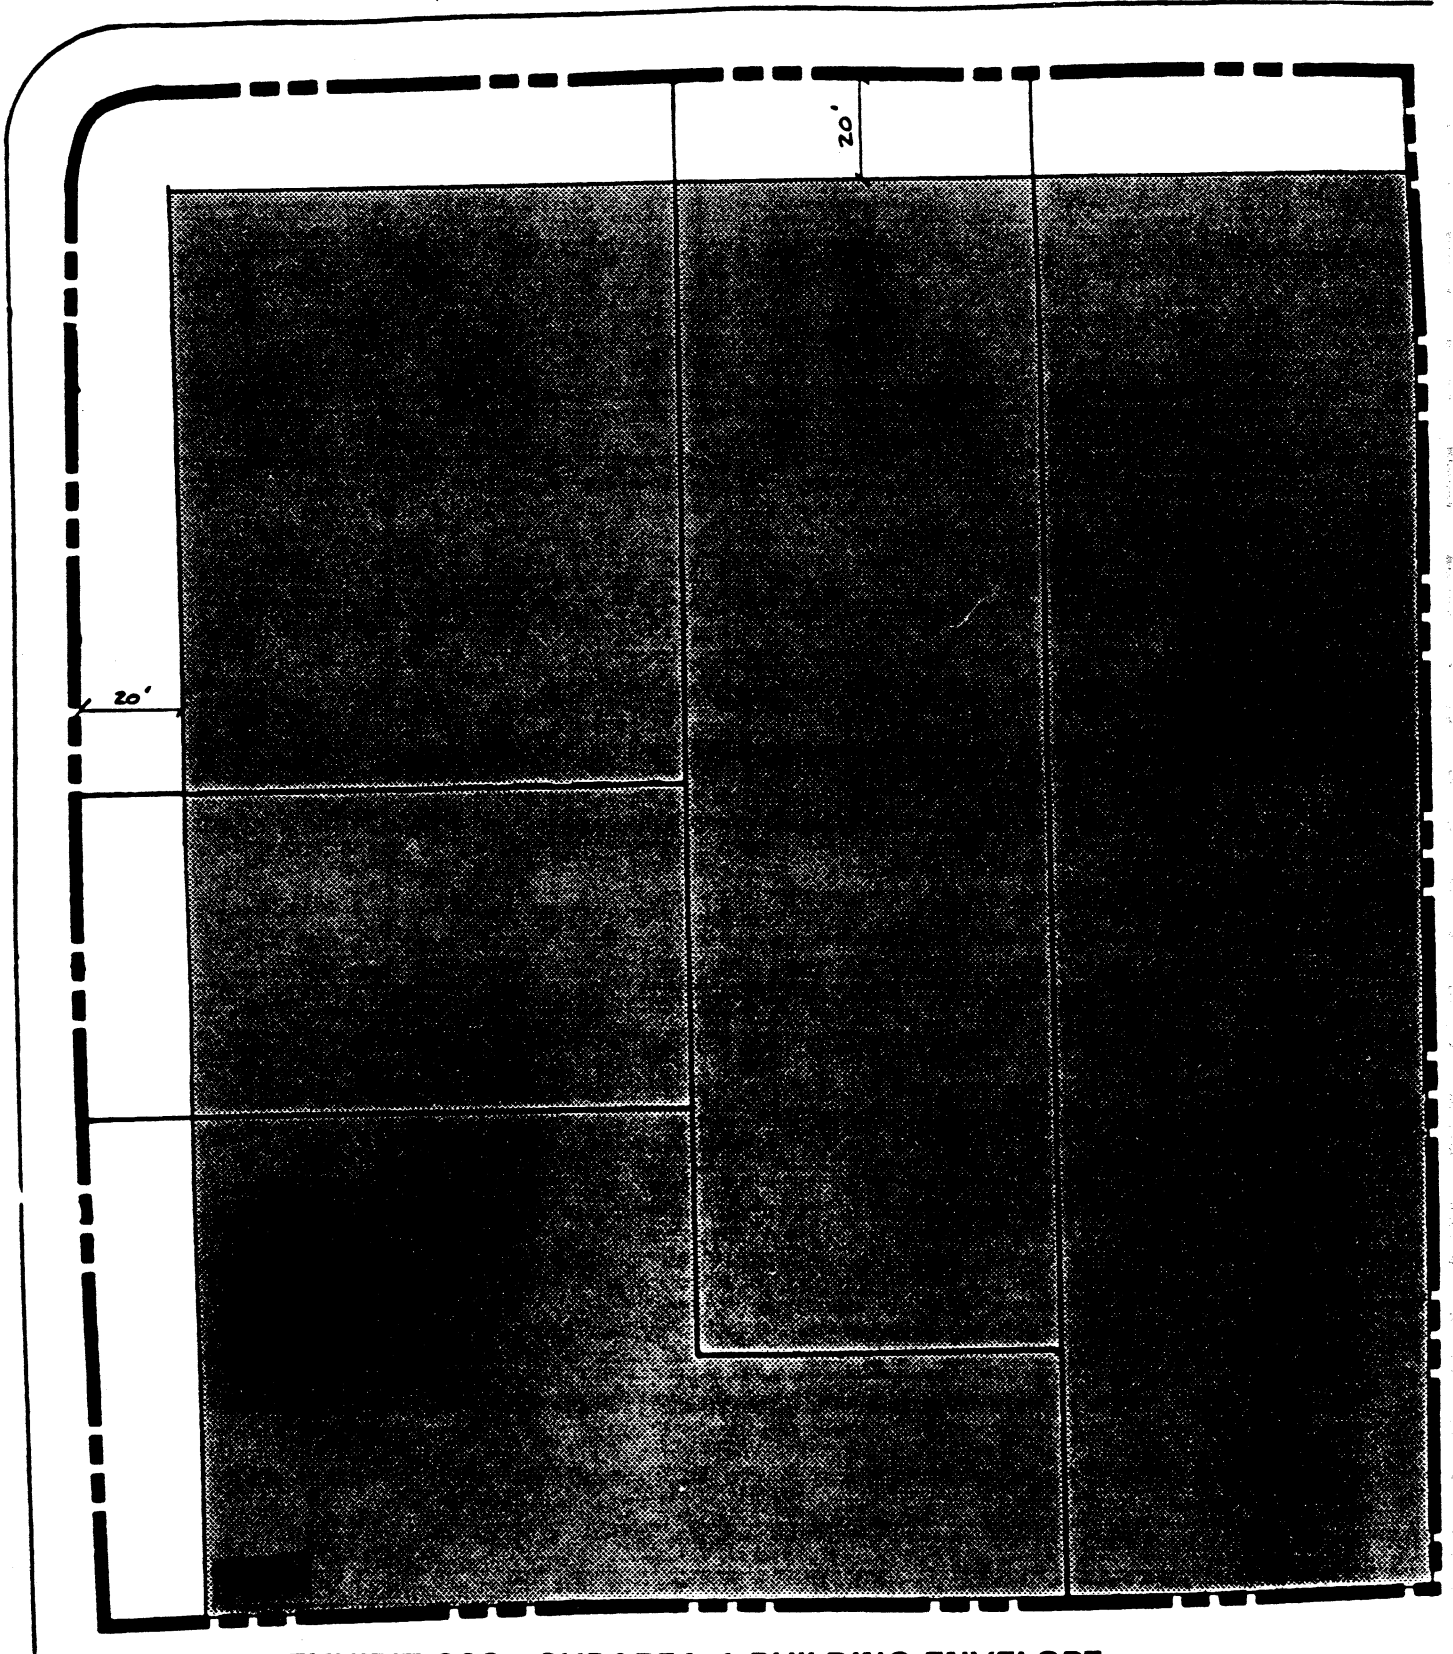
SUBAREA 1 BUILDING ENVELOPE
